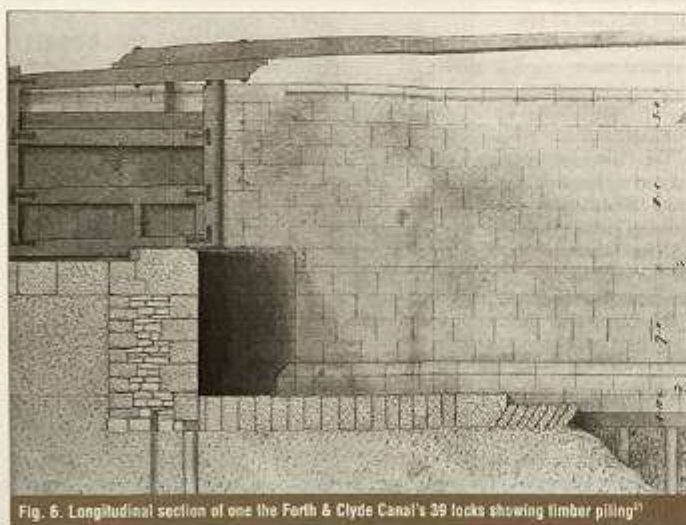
Longitudinal section of one of the Forth & Clyde Canal's 39 locks showing timber piling³¹
